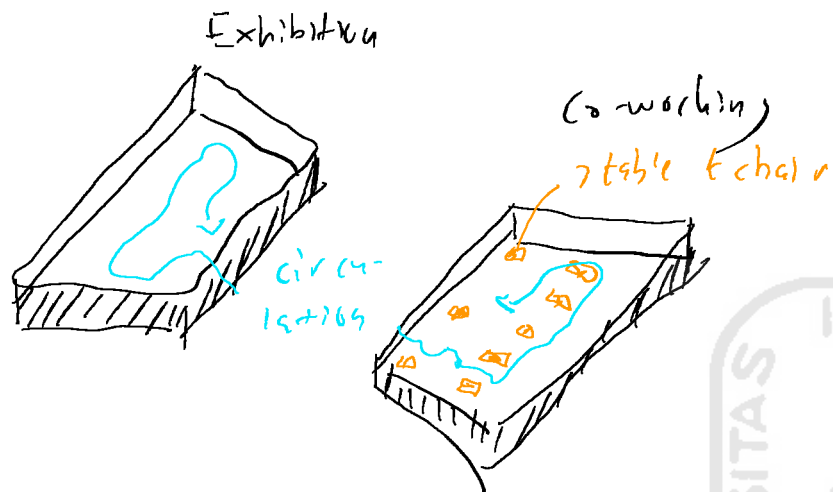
Exhibition Hall/Co-Working Space Layout
